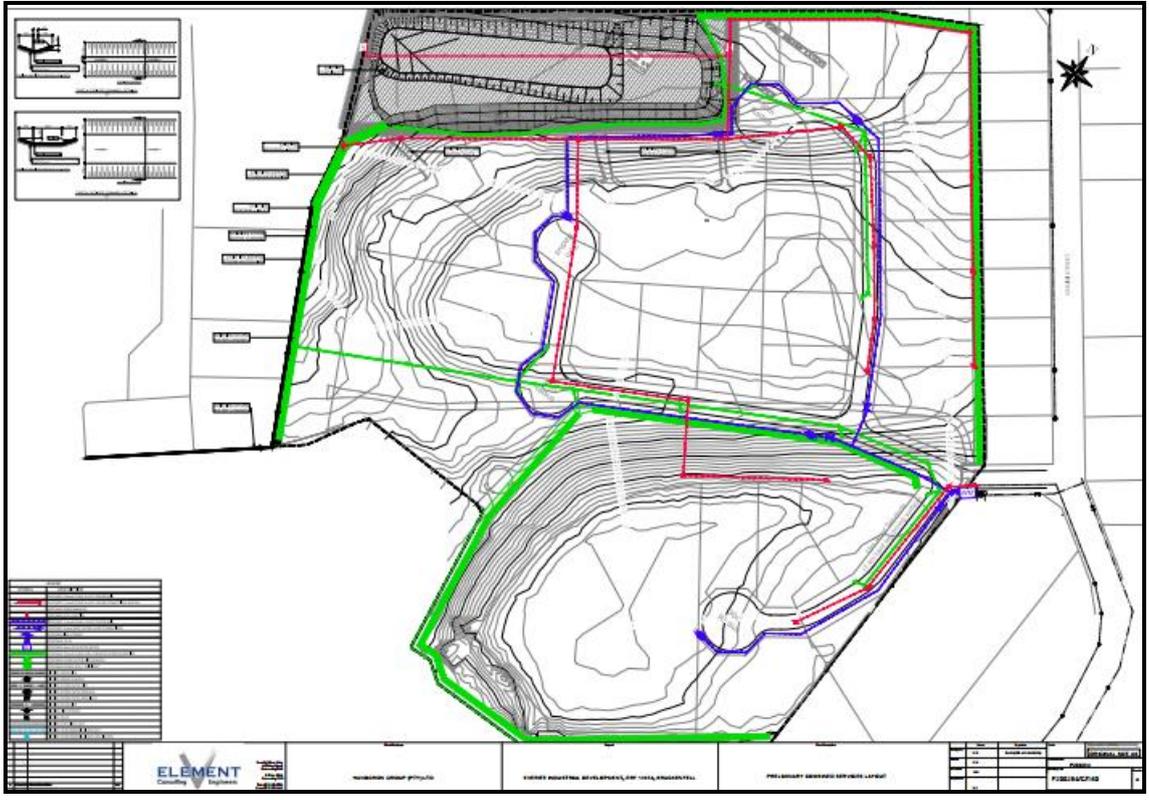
Proposed Services, Combined (Source: Element Consulting Engineers, 2020)
